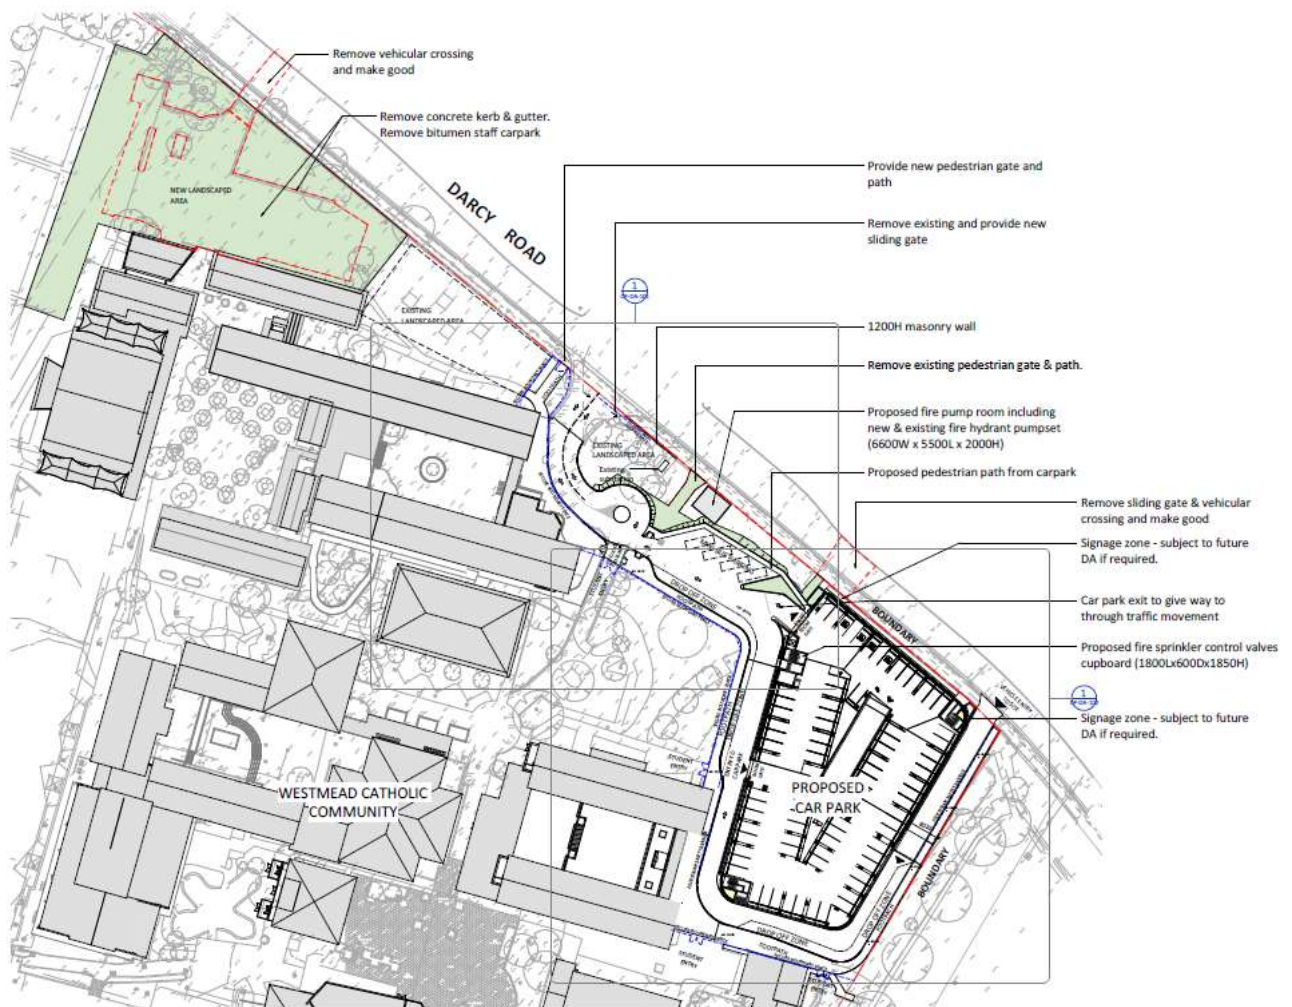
Proposed Site Plan. Source: Alleanza Architecture
